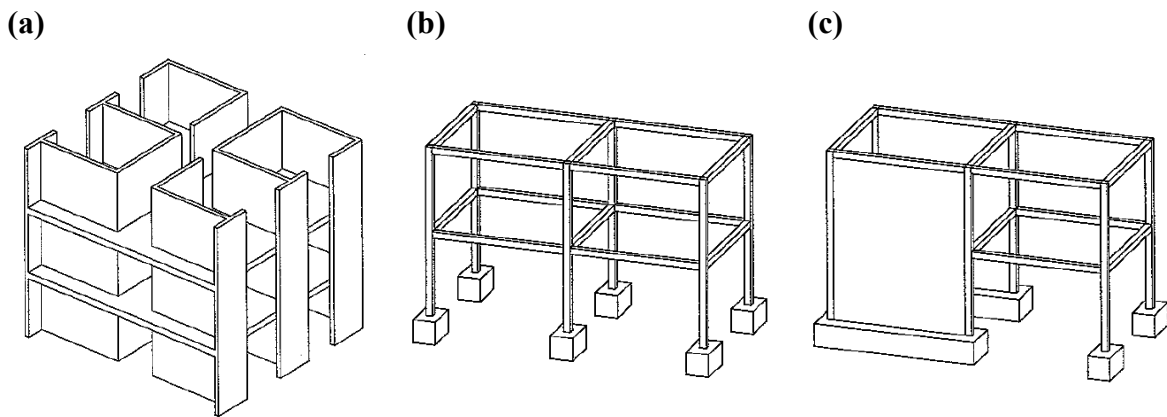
(a): Wall system building, (b): Frame system building, (c): Frame-wall dual system building; figures from Arie, G. (2003).
